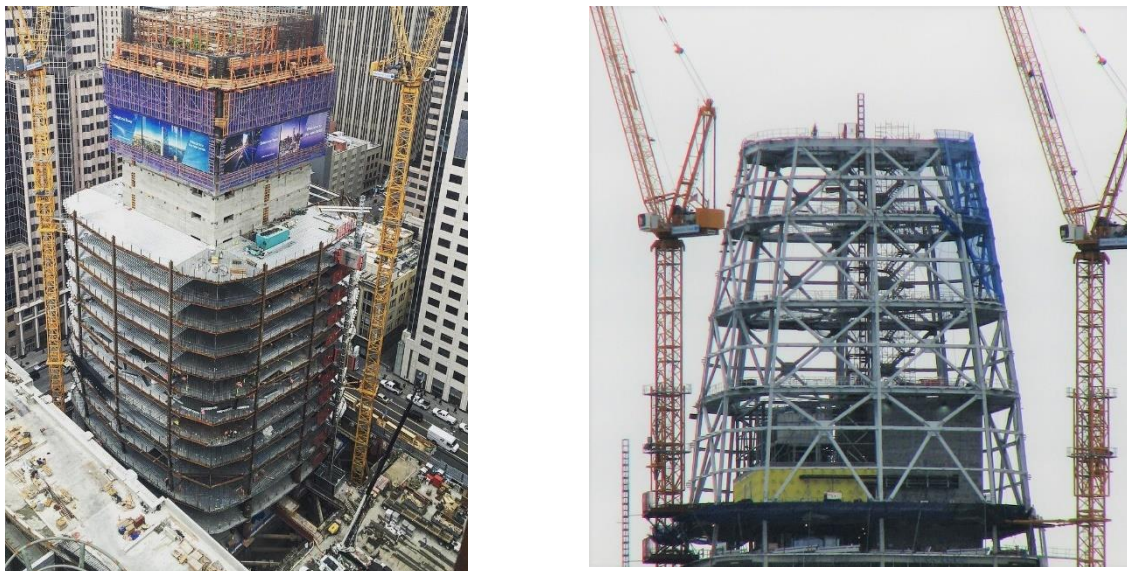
Views of concrete core wall and steel gravity system of Salesforce Tower during construction (left) and the steel crown structure on the top of the building (right).
